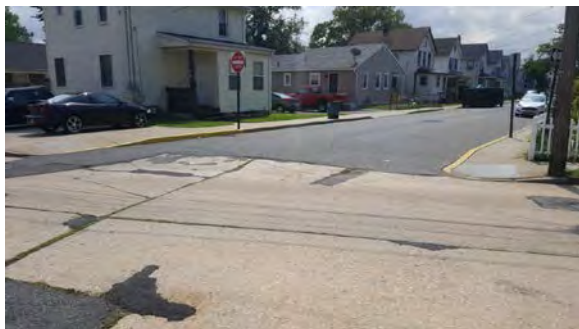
Walnut-Oak Intersection, looking southwest (August 18, 2016)
